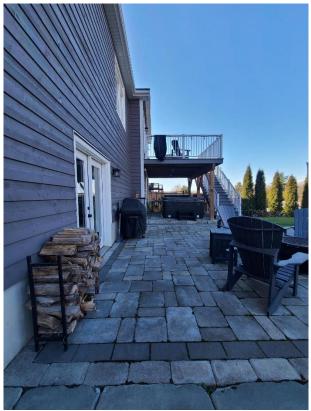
View of existing deck from eastern interior yard (yard towards 1729 Executive Avenue).
